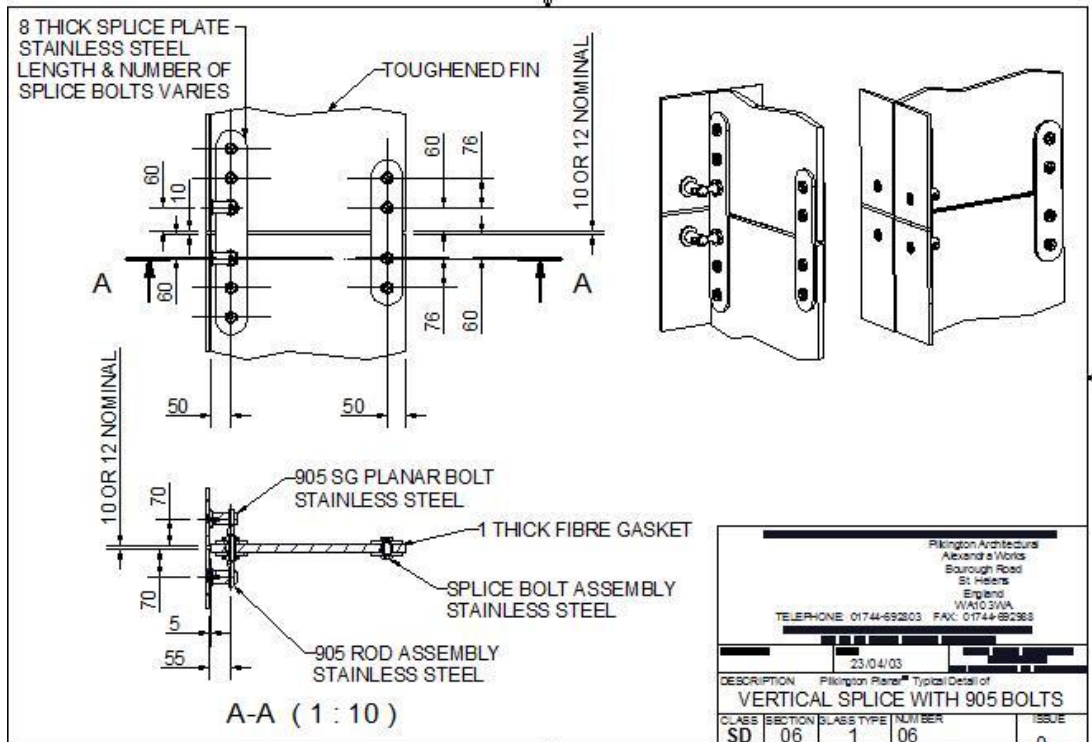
Vertical Splice Bolt Assembly for Curtain Wall Detail (Pilkington, 2009)
